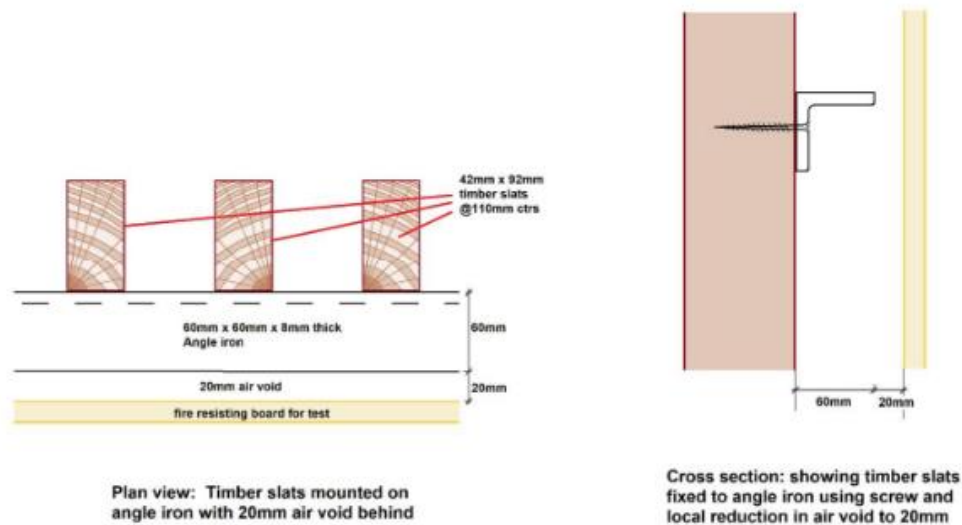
Plan view and cross section drawings showing mounting arrangements onto angle iron leaving nominal 80 mm (20 mm) air void (not to scale)
